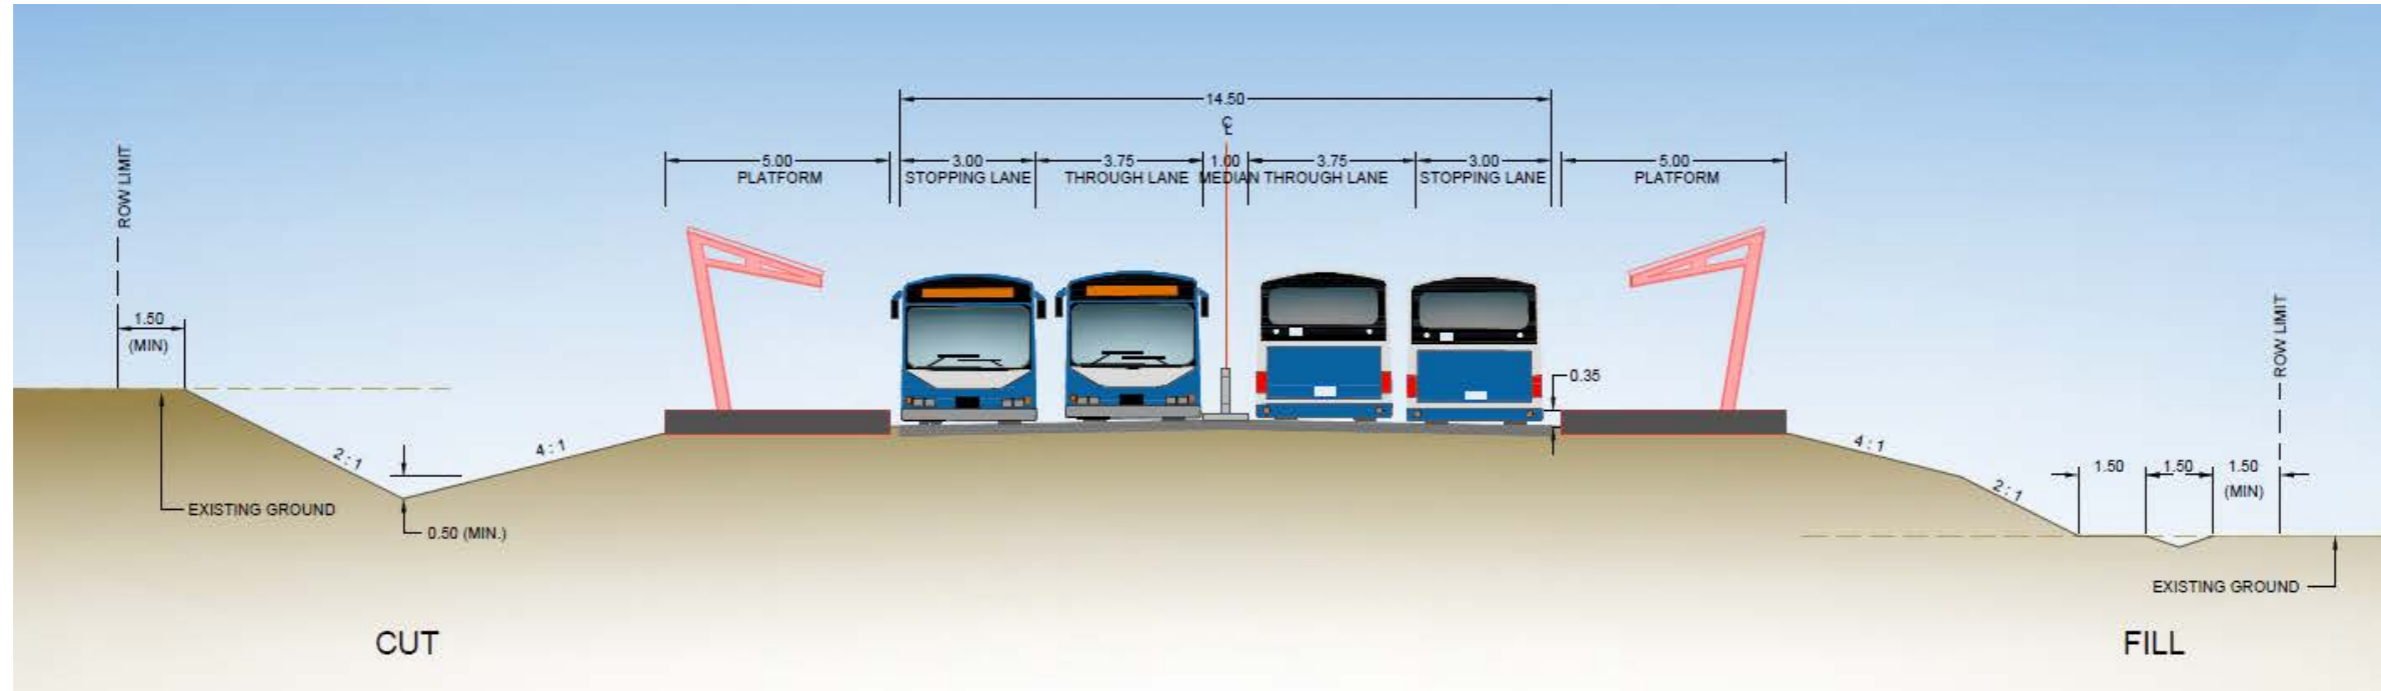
CROSS-SECTION AT STATION APPROACH
